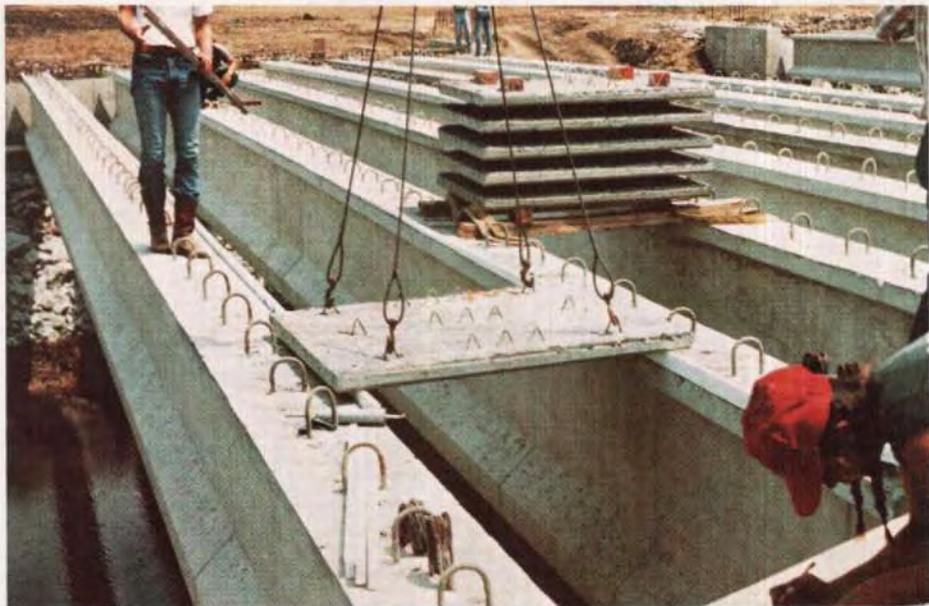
Placing panels on a precast prestressed concrete I beam structure. Note how a group of panels are unloaded from trucks and stored on the beams before lifting each one into place.
